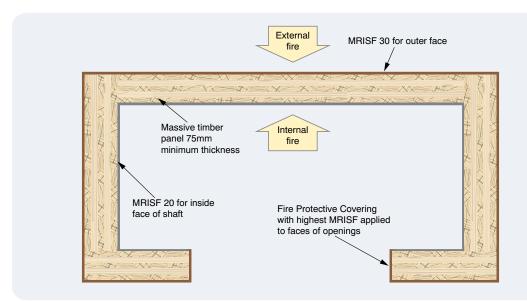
MRISF requirements for typical stair and lift shaft construction for single skin massive timber panel construction.
